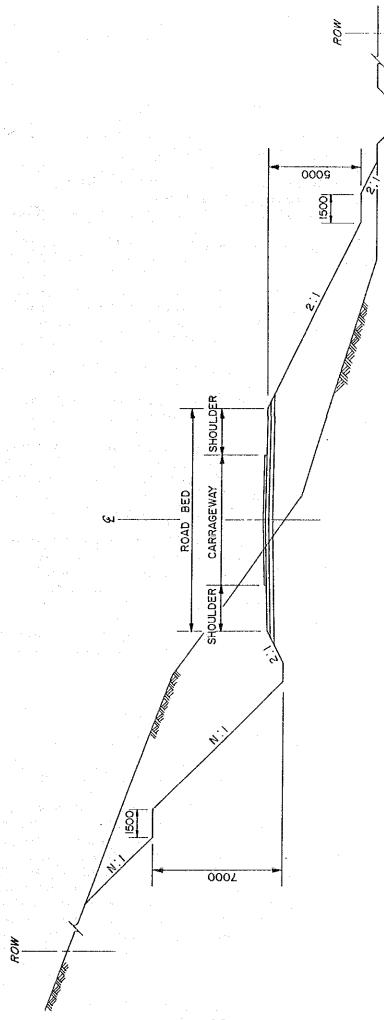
TYPICAL CUT AND FILL SECTION
